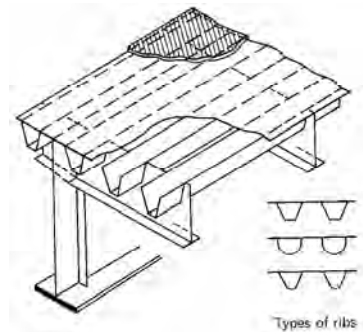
Orthotropic steel bridge deck (AISC 1962).
